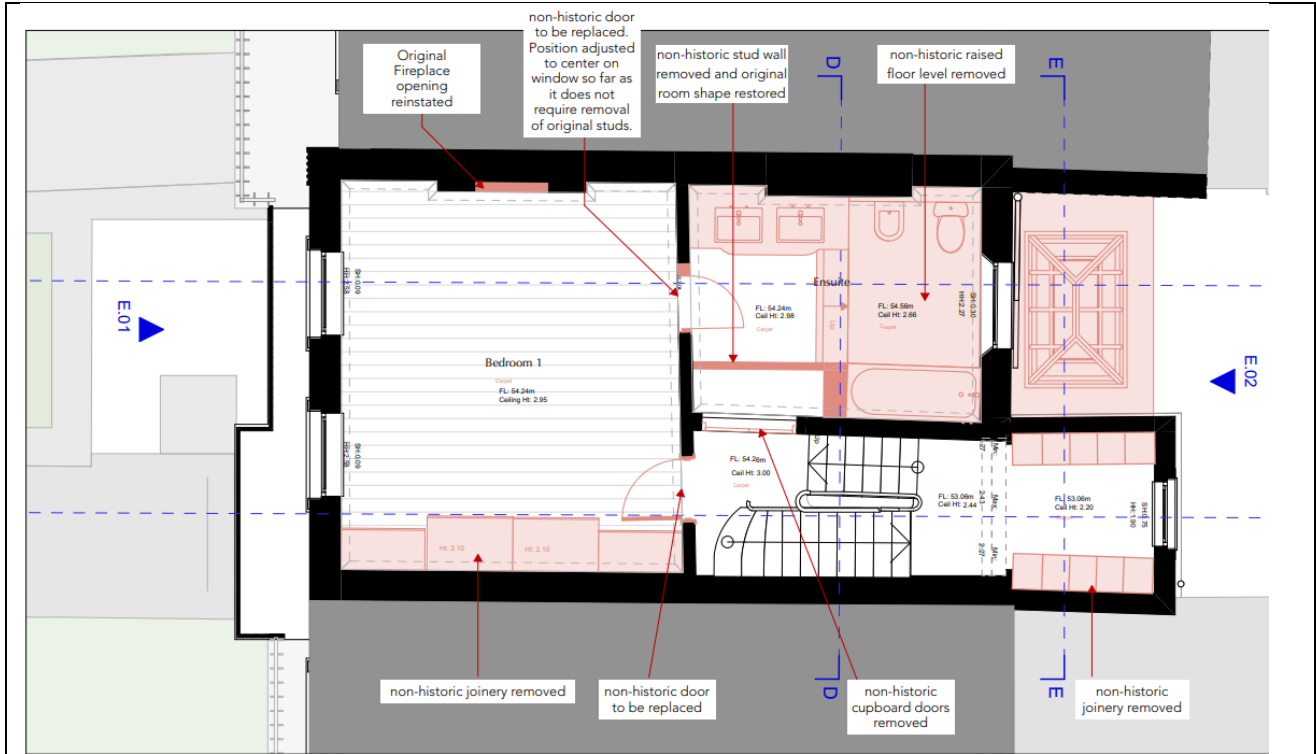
Lower Ground Floor - Proposed Floor Plan
